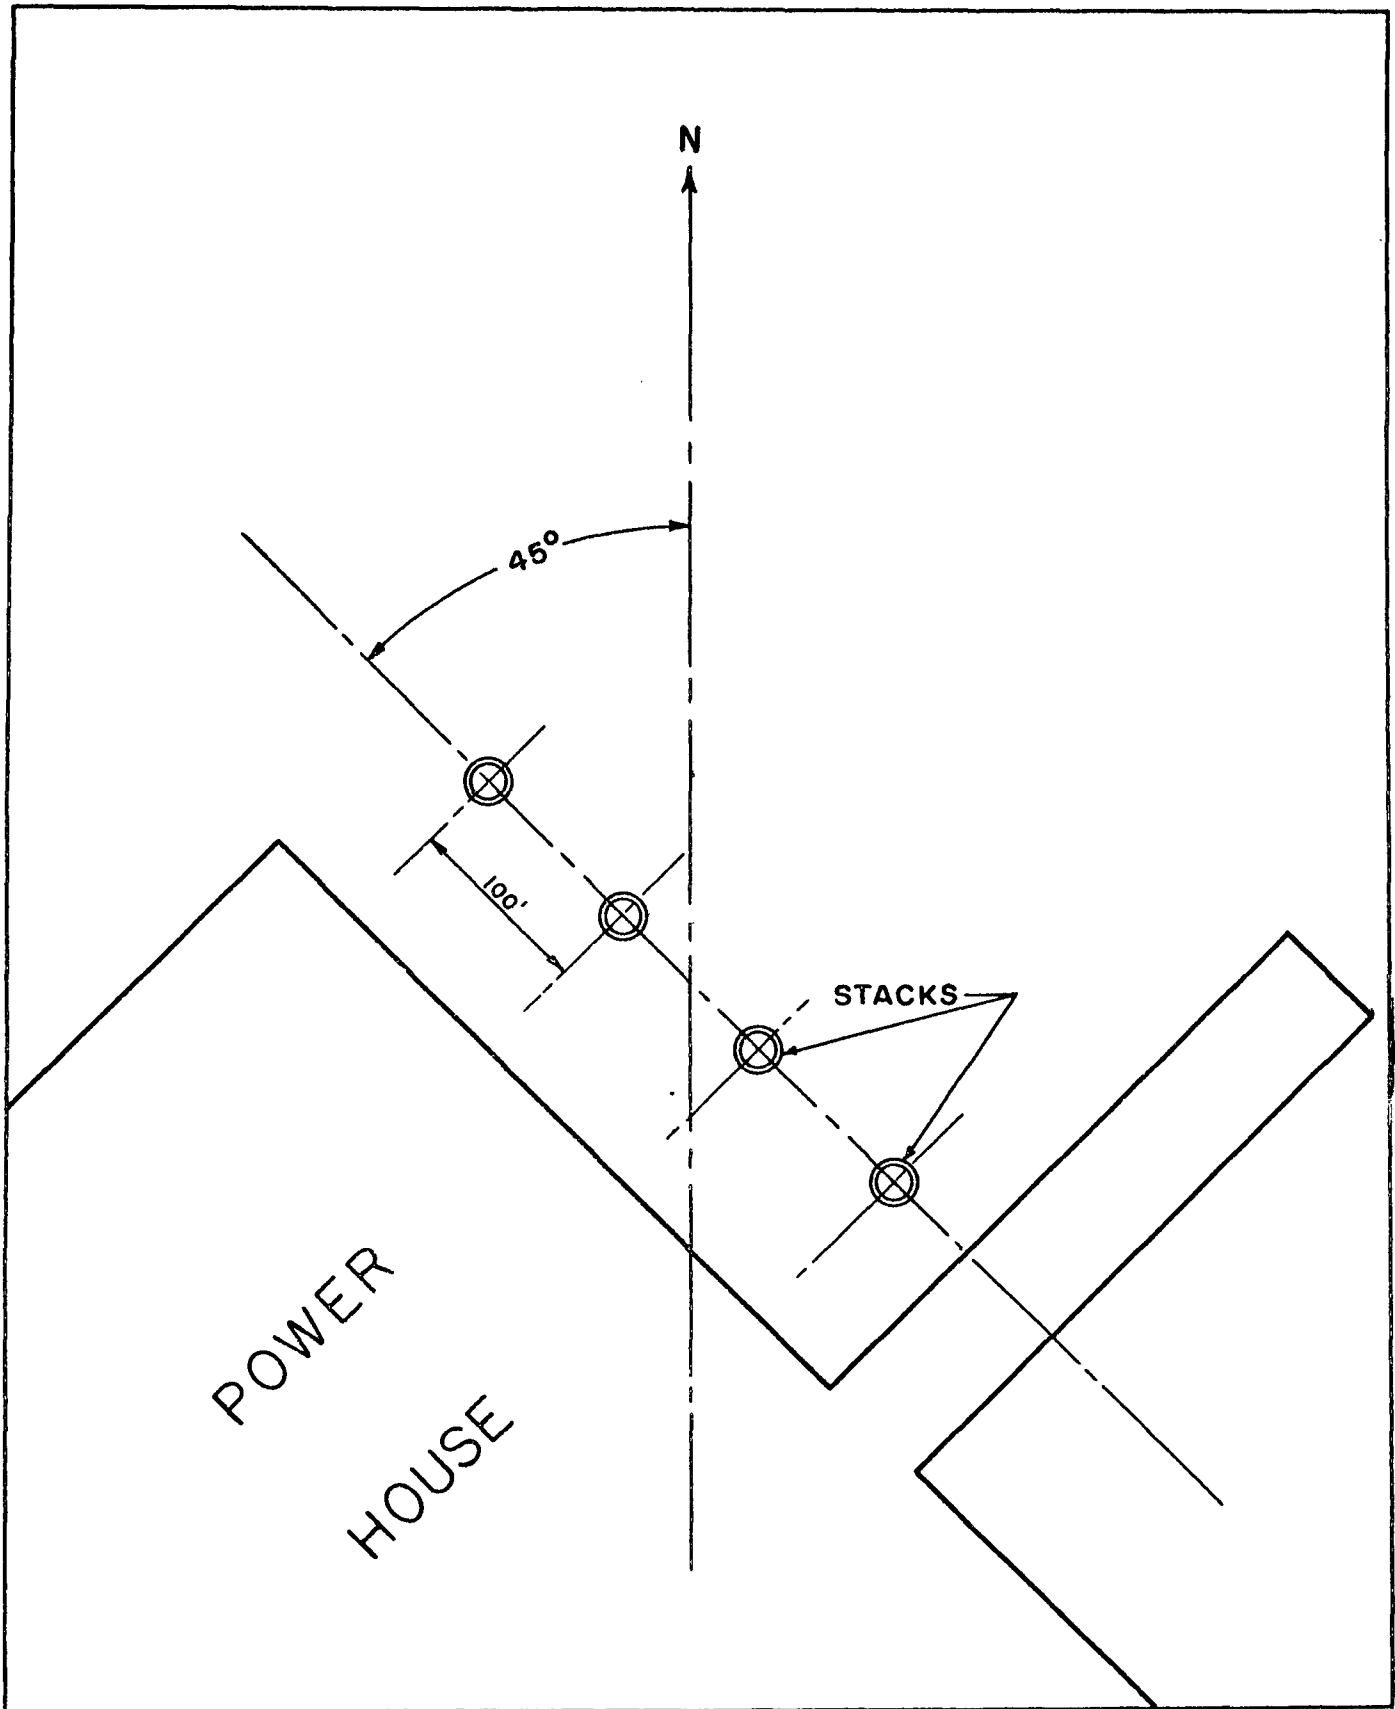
SEPARATION AND ORIENTATION OF STACKS - COLBERT STEAM PLANT
